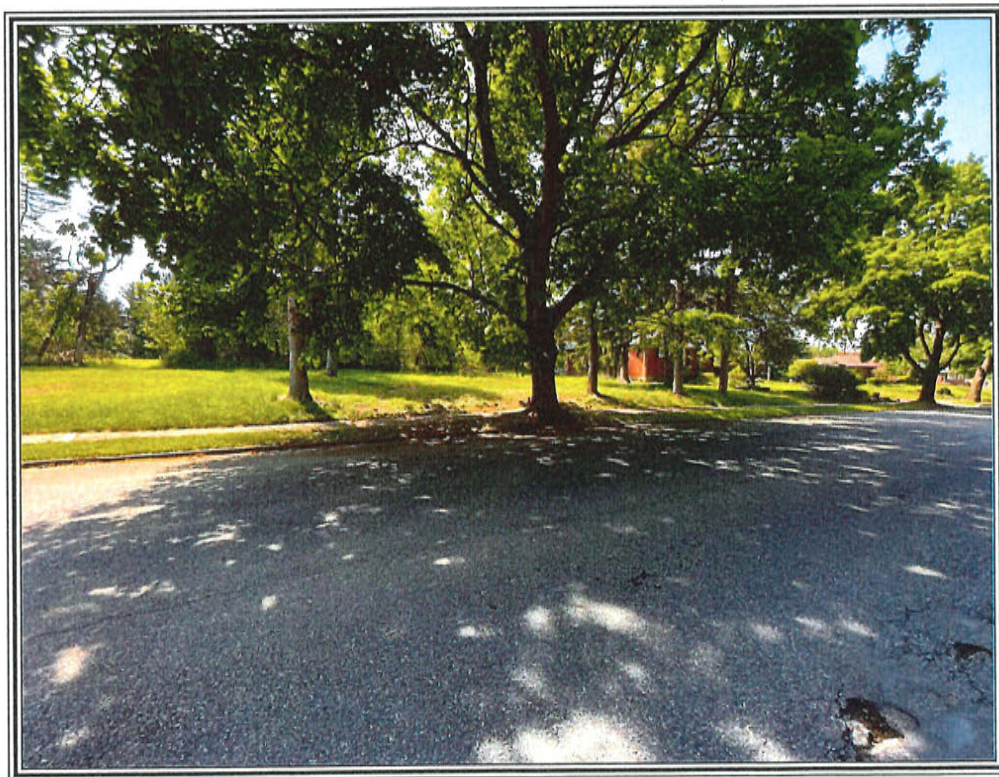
LOOKING NORTH-WEST INTO THE SITE FROM KELCHNER ROAD
